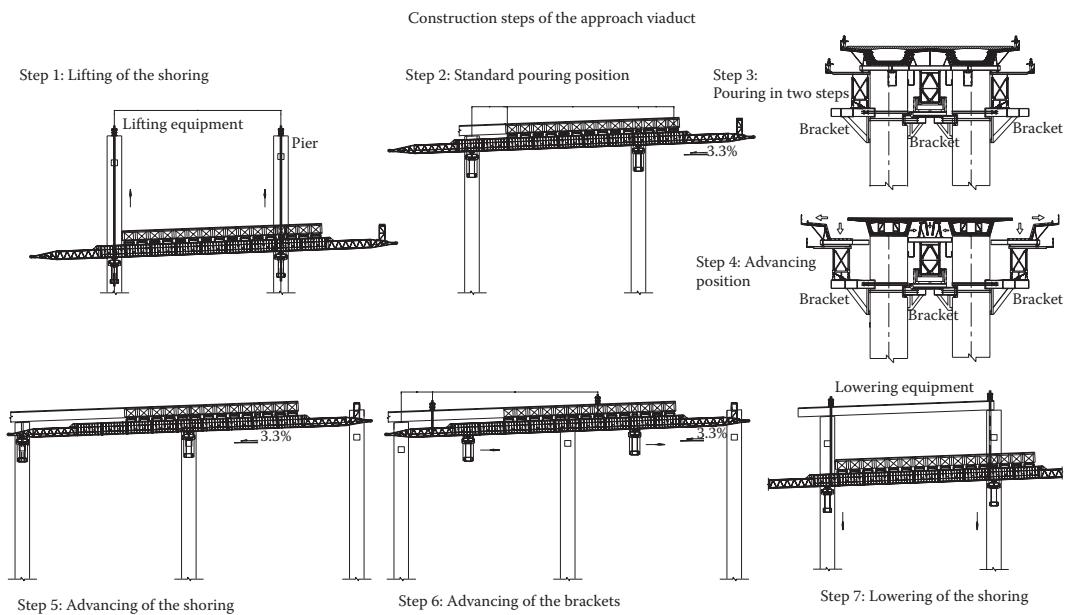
Steps 1, 2, 3, 4, 5, 6, and 7 of construction of eastern approach viaduct (Suez Canal Bridge).
